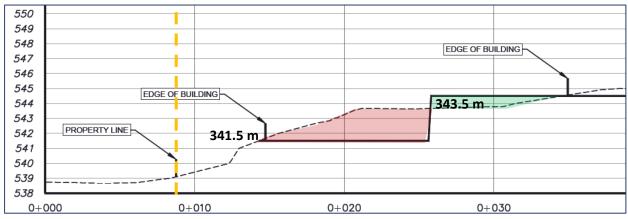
Proposed Cuts (Red) and Fill (Green) for Congregate Housing Buildings
